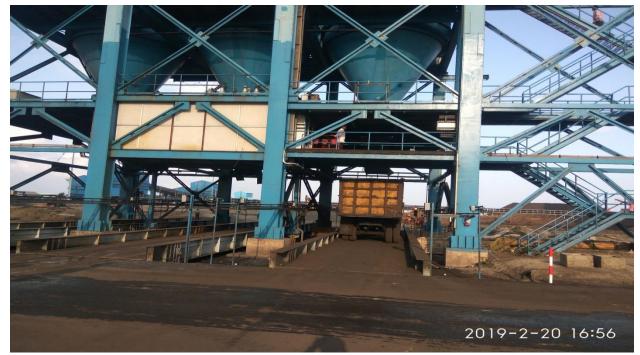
Coal Loading through Mechanized System (Truck Loading System) in to Trucks
